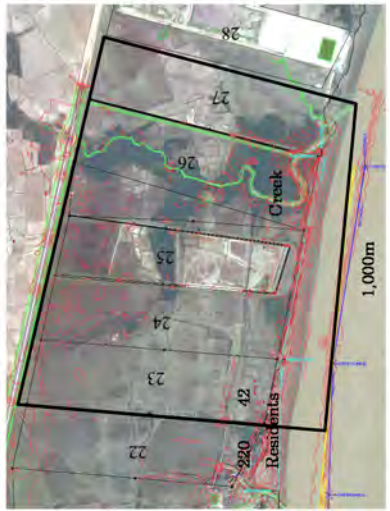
Layout Plan of the Soil Improvement and Pavement
